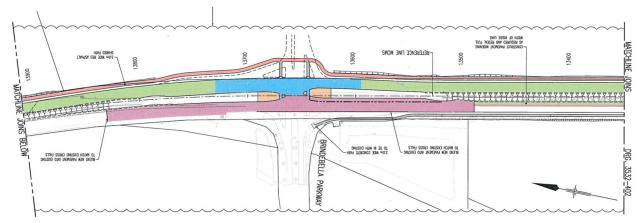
Marmion Avenue Duplication Plans (near Brindabella Parkway)
